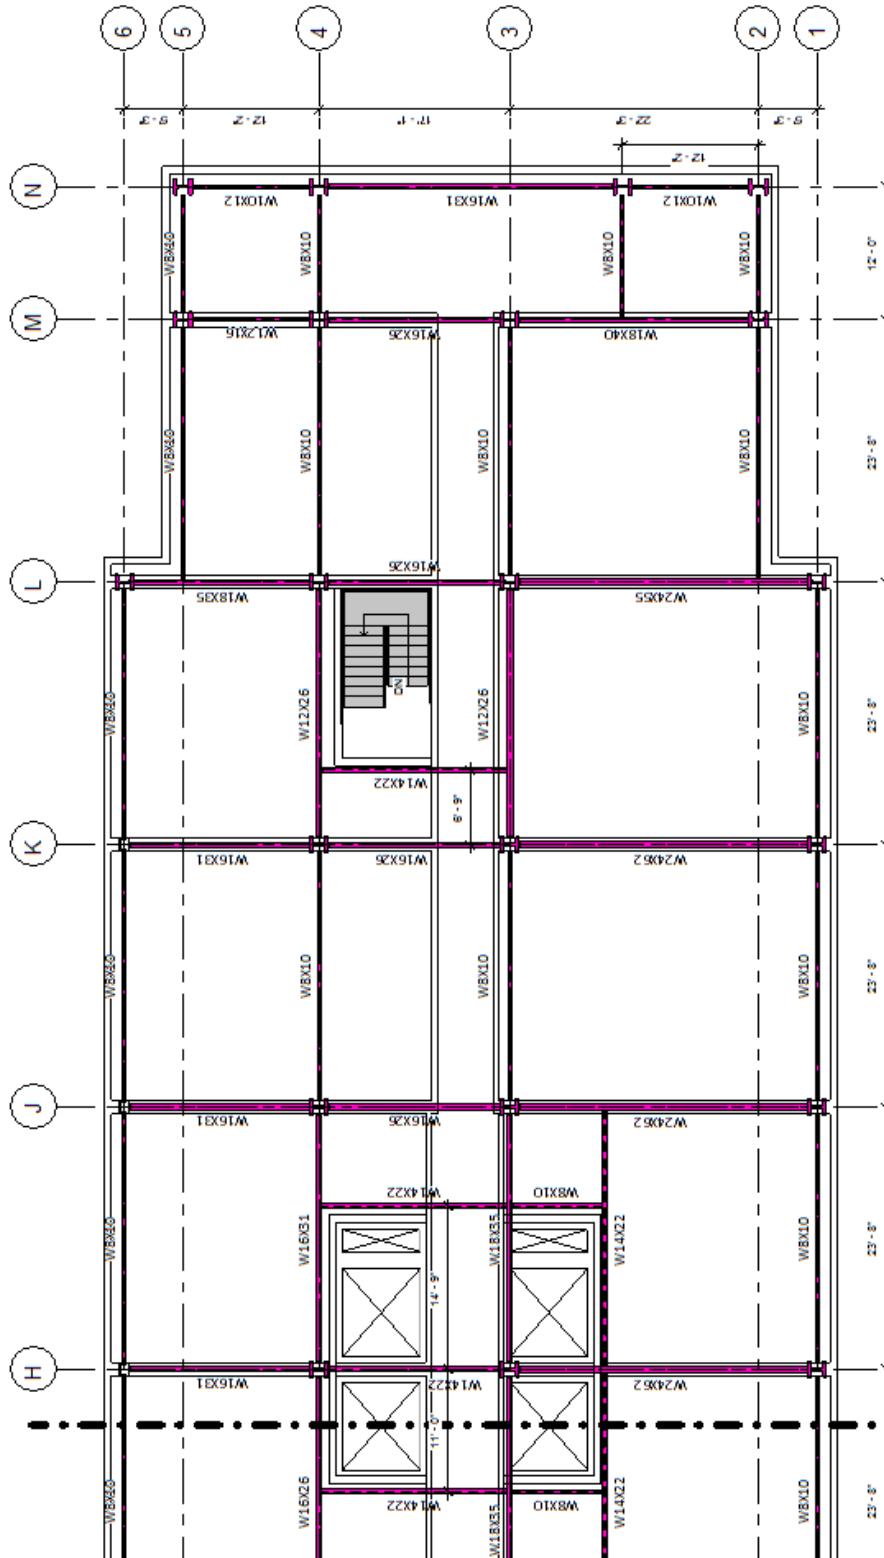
Typical Framing Plan for Residential Levels of Proposed Design
